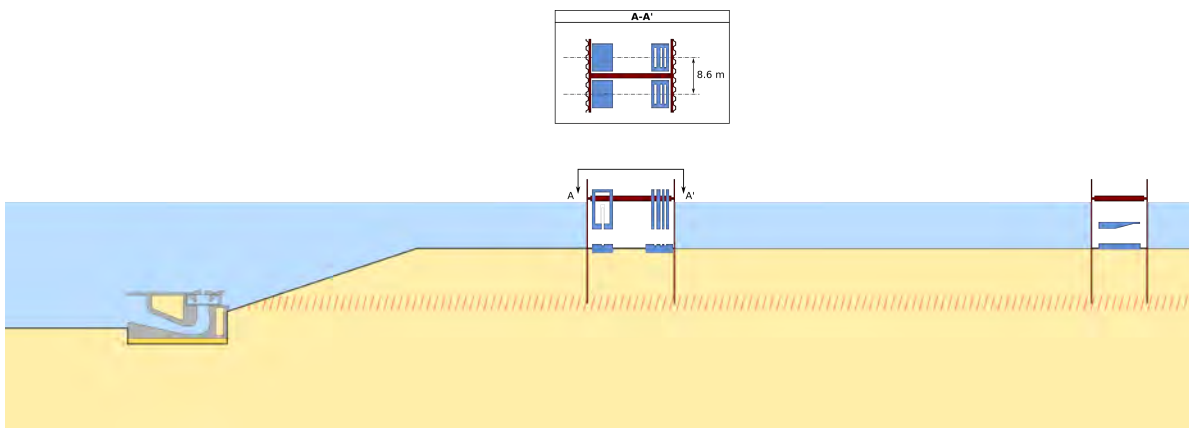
In-situ construction of emergency gate housing and sea-side inlet
